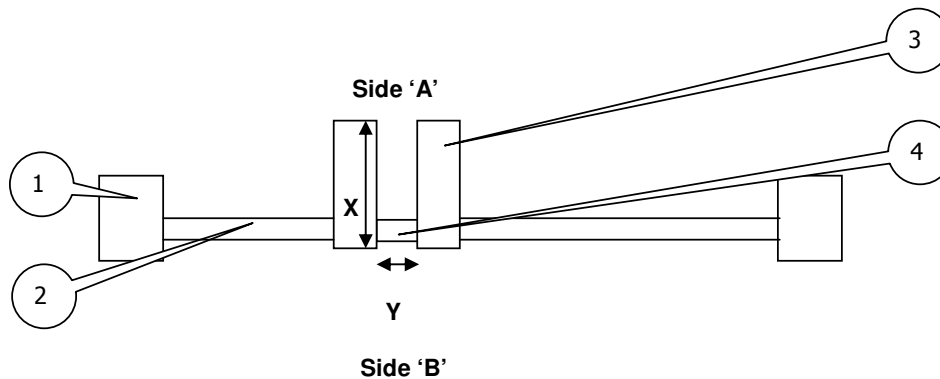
Test configuration for vertically oriented cavity barriers within walls (plan)
